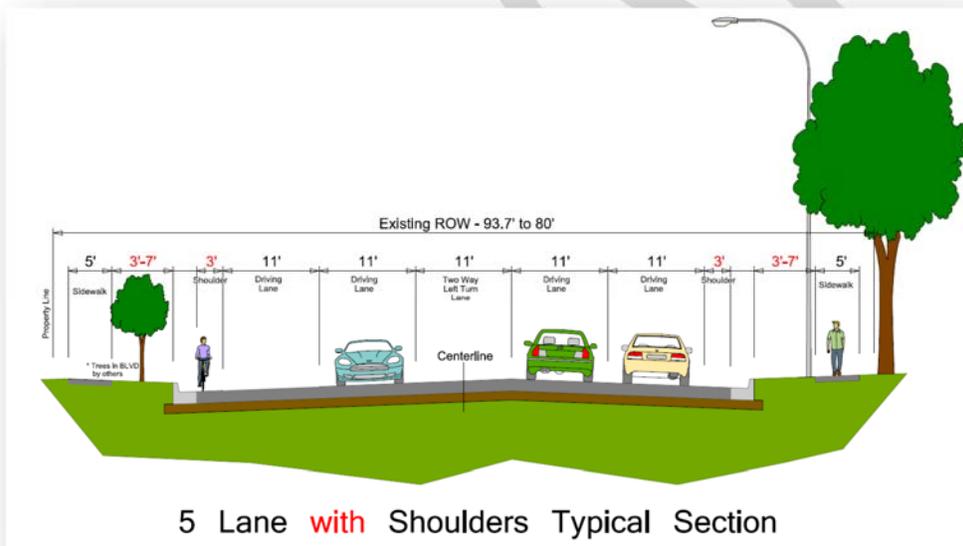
On-street bicycle lanes (3' shoulders + 2' gutter pans) are shown in this proposed typical section.
